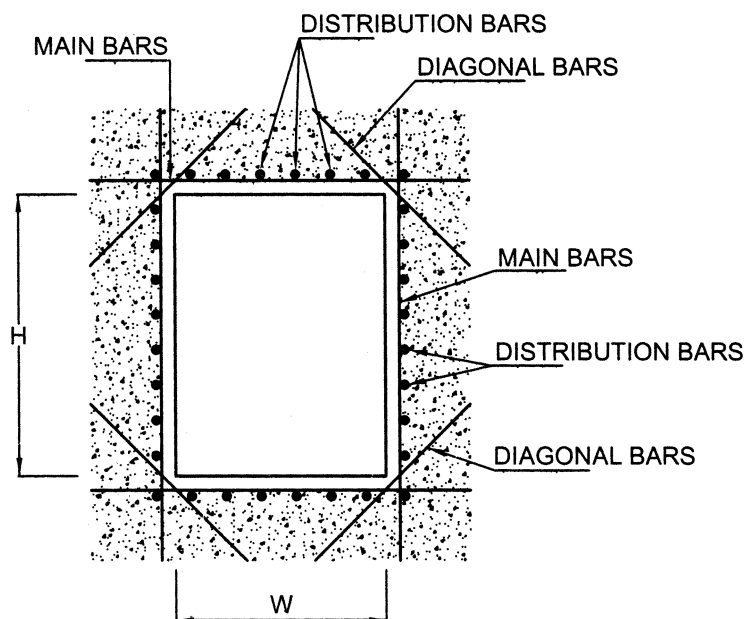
TYPICAL REINFORCEMENT DETAILS AROUND A SLUICE
